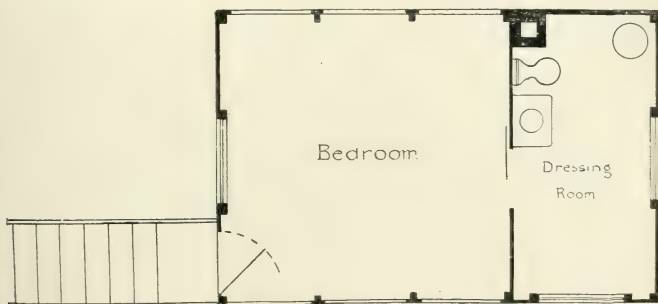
The Millet Sanatorium. Floor plan of shack.
